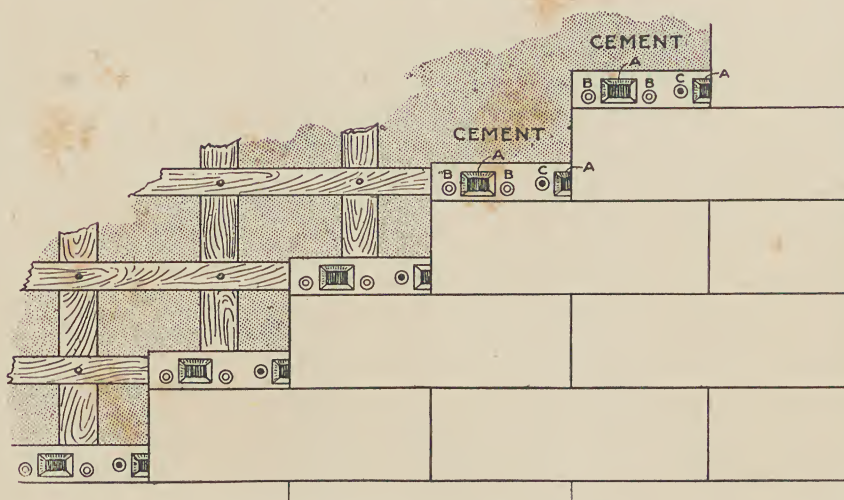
Hall's New Improved Patent Hanging-tiles.
